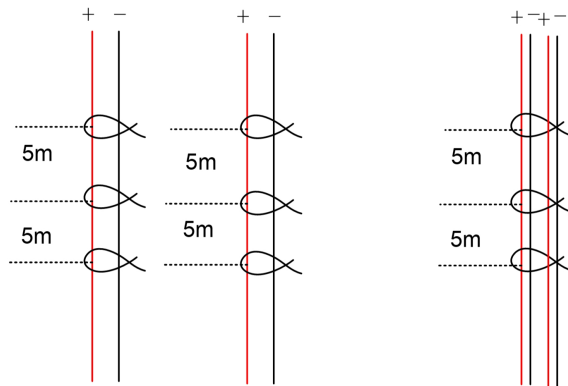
Fastening of Single-core Cables (Single Cable)
